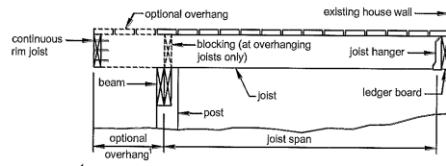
JOISTS WITH DROPPED BEAM - DECK ATTACHED AT HOUSE
